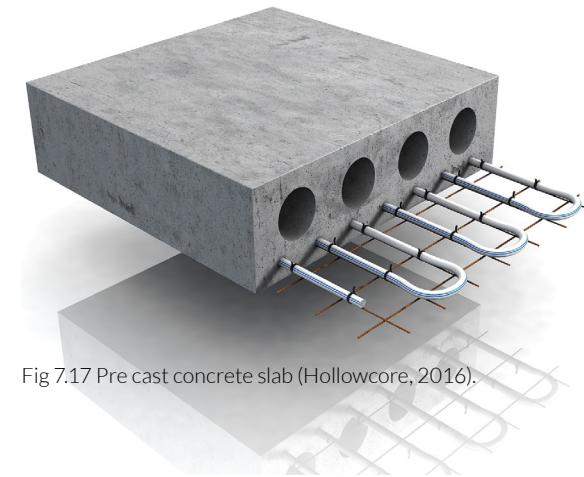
Pre cast concrete slab (Hollowcore, 2016).
